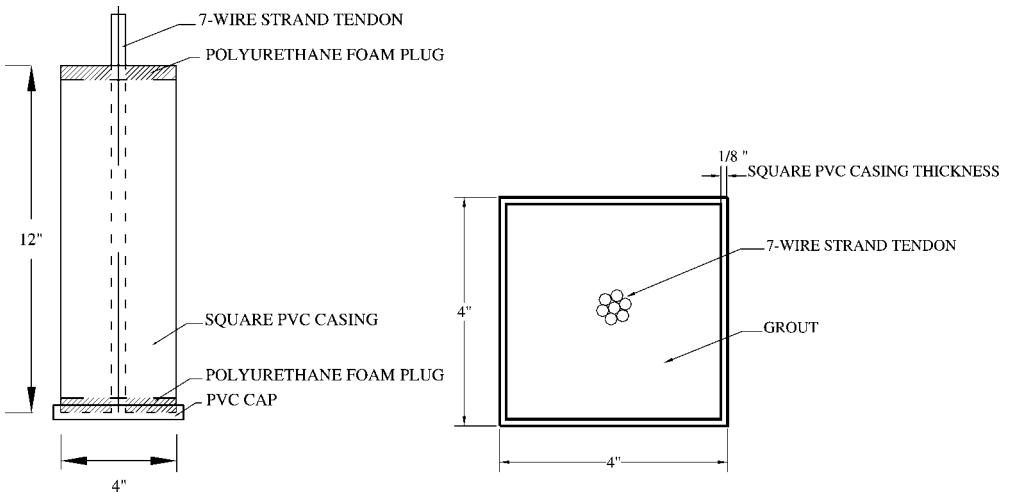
Elevation and expanded plan of typical grouted specimen.
